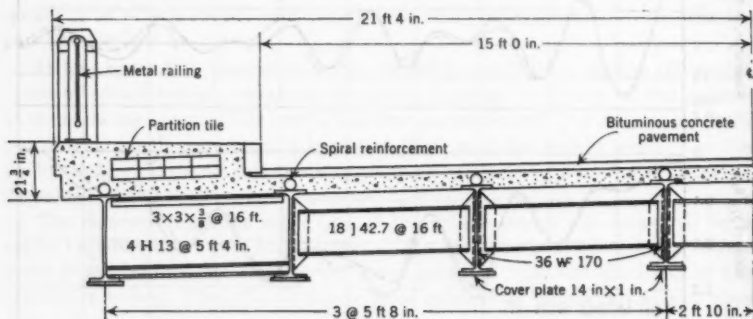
TOWNSEND (MASS.) MAIN STREET BRIDGE
